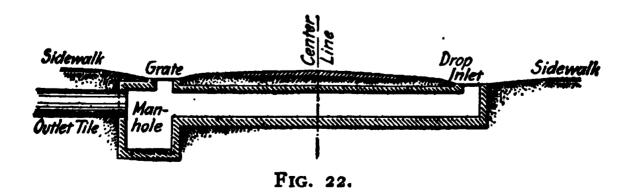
shows a form of culvert often used in village streets where deep ditches at the culvert site would be objectionable. While vitrified pipe or concrete pipe are not recommended for cross culverts in high-class improvements they are the most suitable
